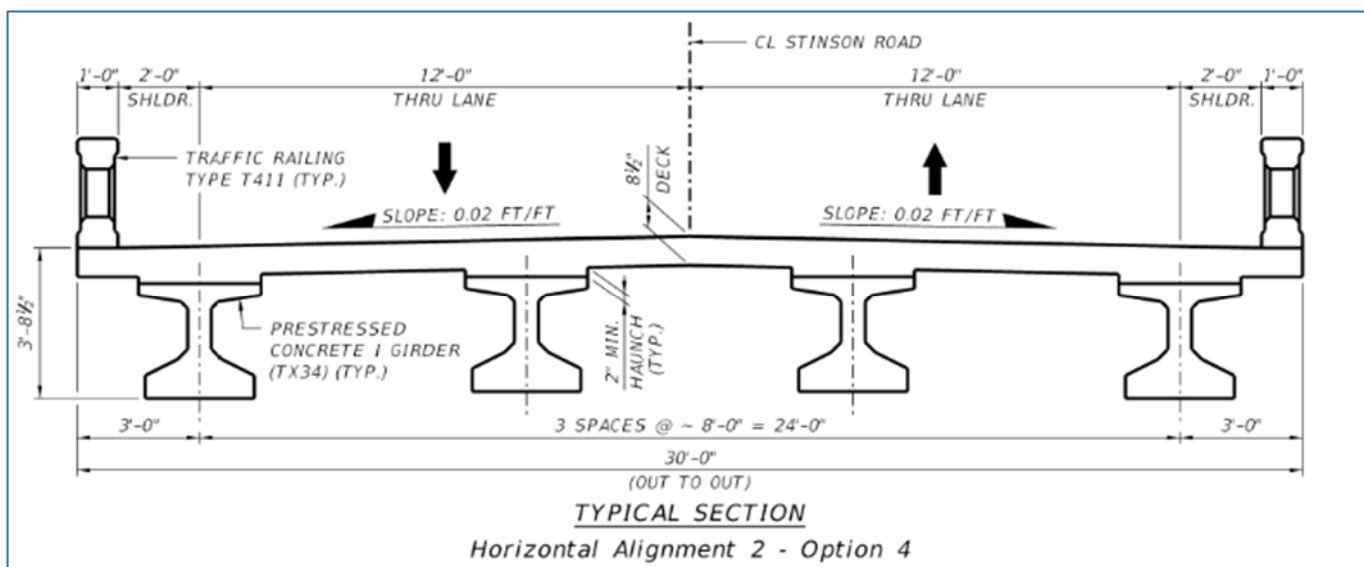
TxDOT Prestressed Concrete I-Girders (TX34) Typical Section
